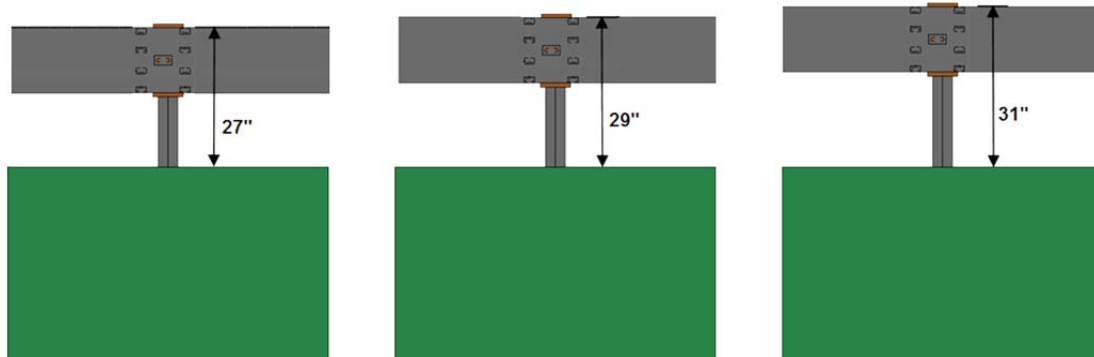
Illustration of the guardrail heights of the three FE guardrail models.
